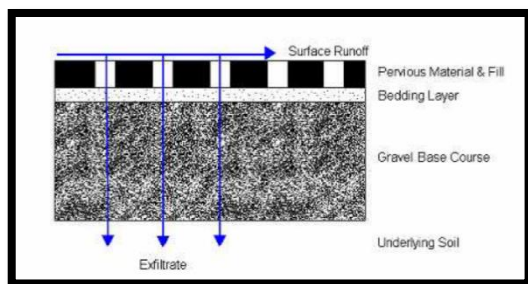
Cross section of a typical block paver permeable pavement installation without underdrains
